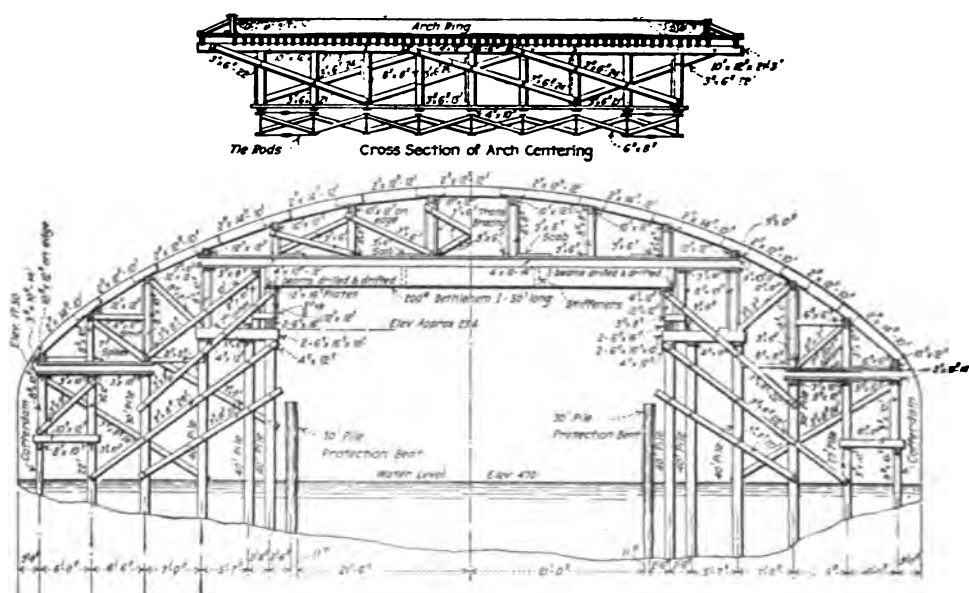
Details of arch centering and supports for 110-ft. span of San Jacinto bridge, Houston, Texas. Note size of opening for navigation.
